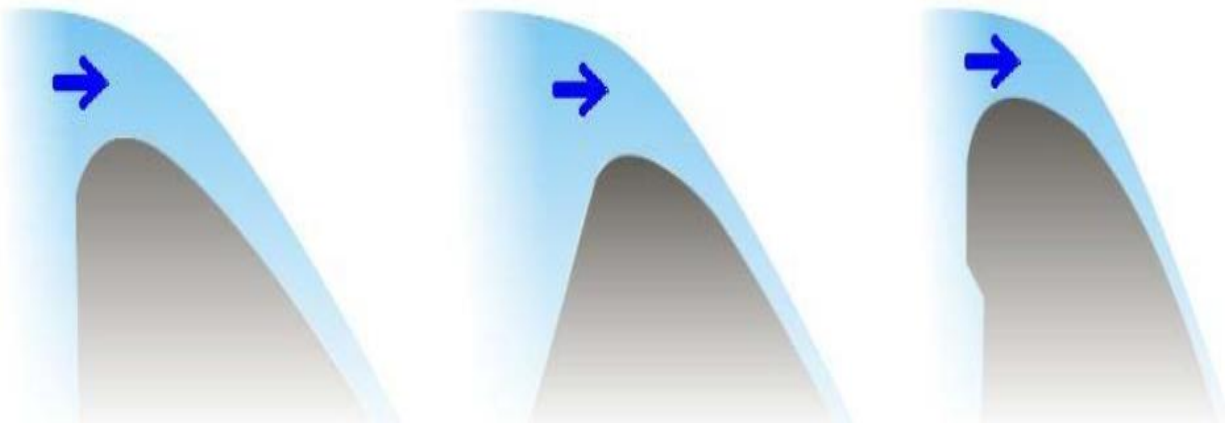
ogee crest weir with vertical, inclined and overhangs upstream face
